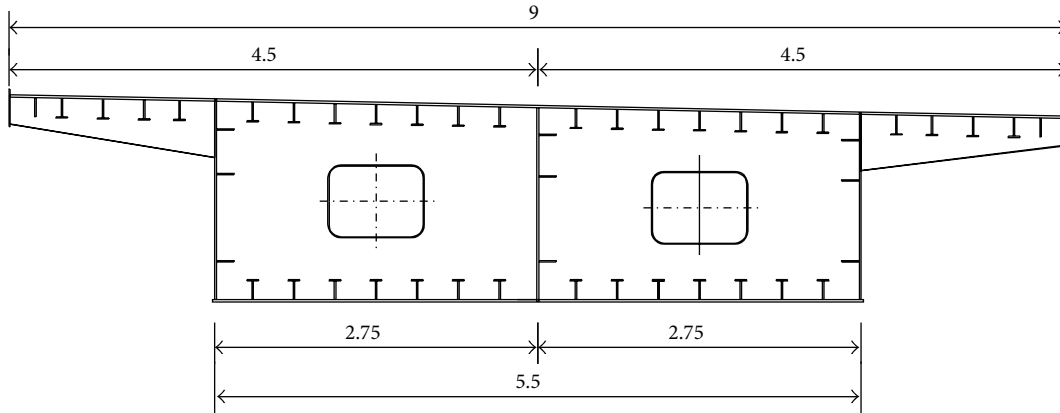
Cross-sectional layout of steel box girder bridge (m).
